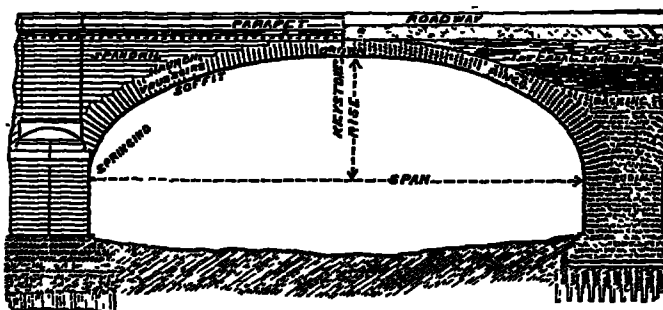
Half Elevation and Half Section of Arch of London Bridge.
